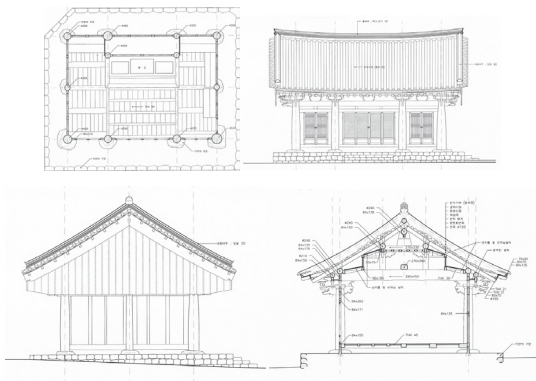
Seodongsa Daeungjeon (Plane, Elevation, Side, Longitudinal section)
